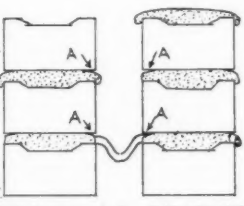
BRIDGE B & DAMP PATCH INSIDE.
